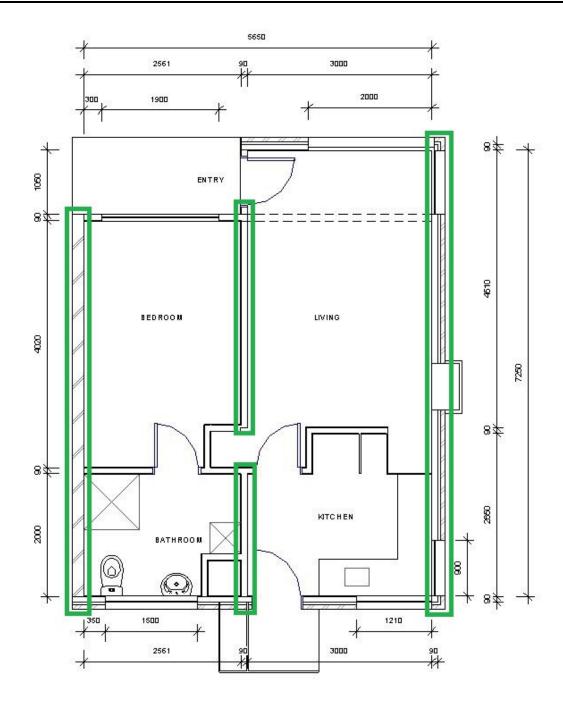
Walls used for bracing in the transverse direction in Blocks A and B.
